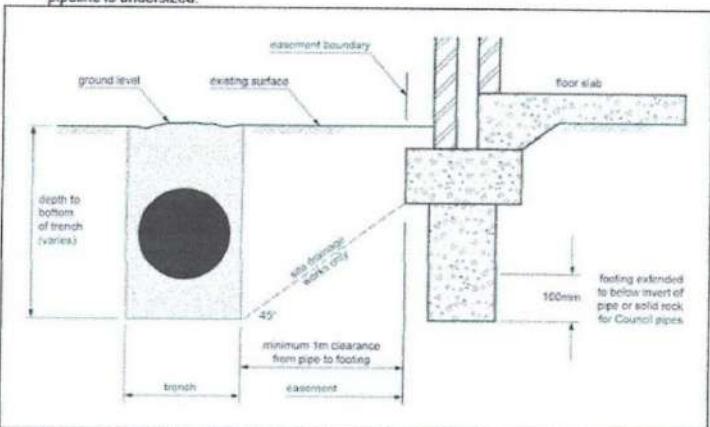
Building near and over stormwater and subsurface drains
